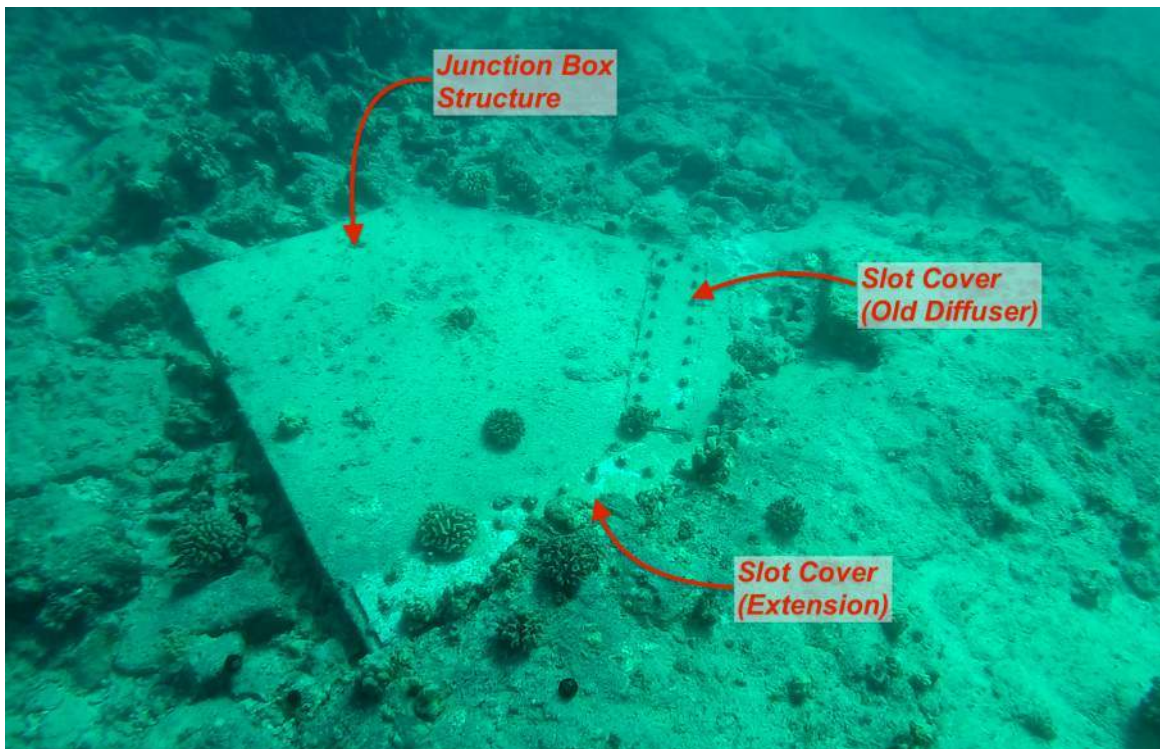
Special wye structure, looking NE, with stainless steel slot covers visible at lower right edge.
